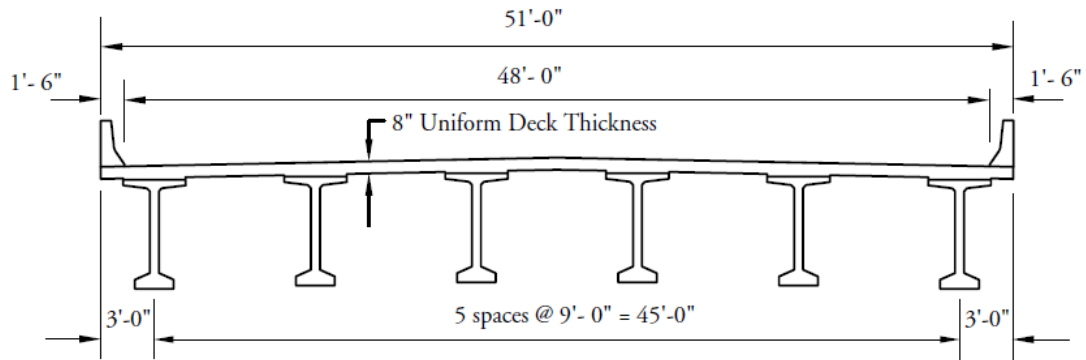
Typical bridge cross section including BT-72 Bulb-Tee girders used for finite element simulation. Adapted from *PCI Bridge Design Manual* (PCI, 2003).
